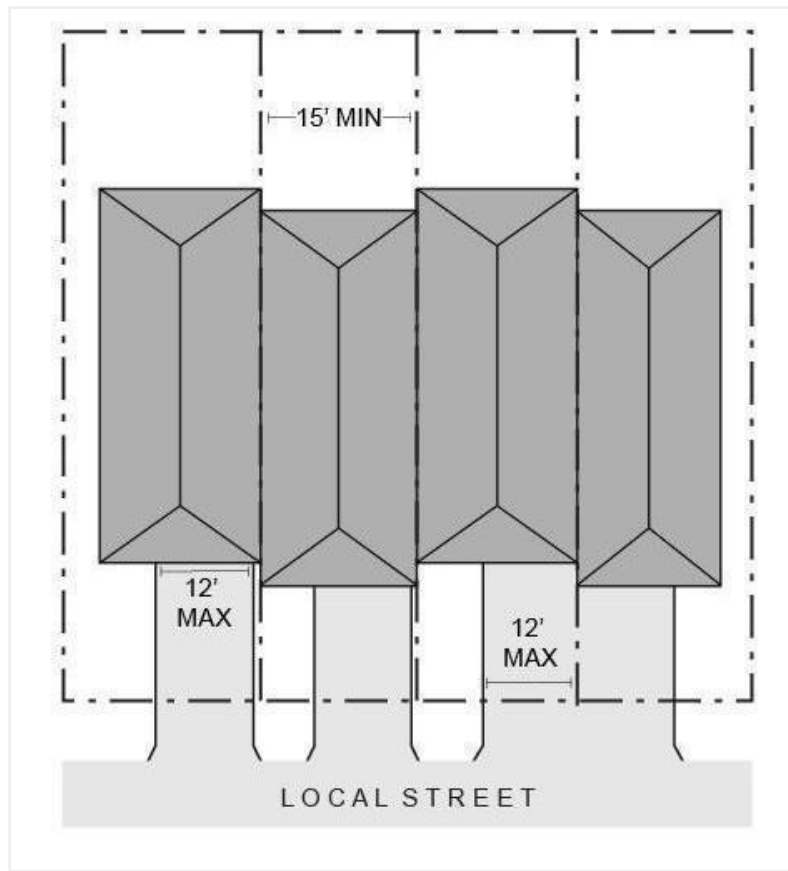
d. Townhouses with Parking in Front Yard
